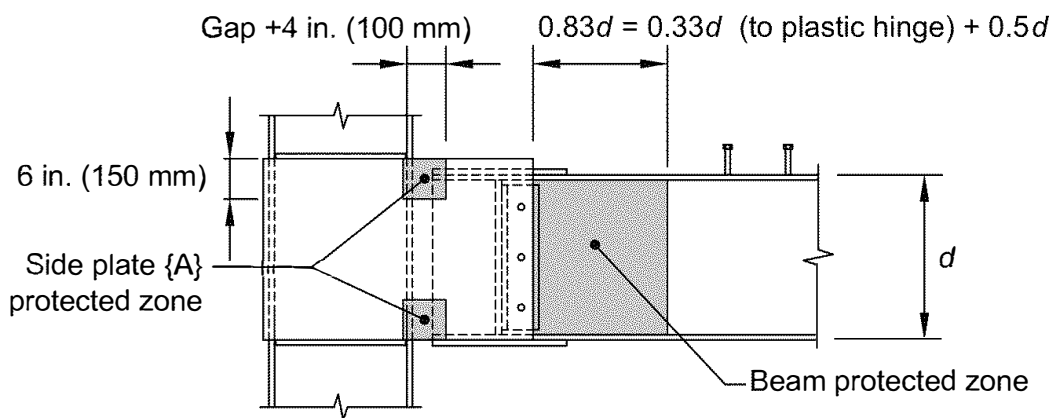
Location of beam and side plate protected zones (one-sided connection shown).
